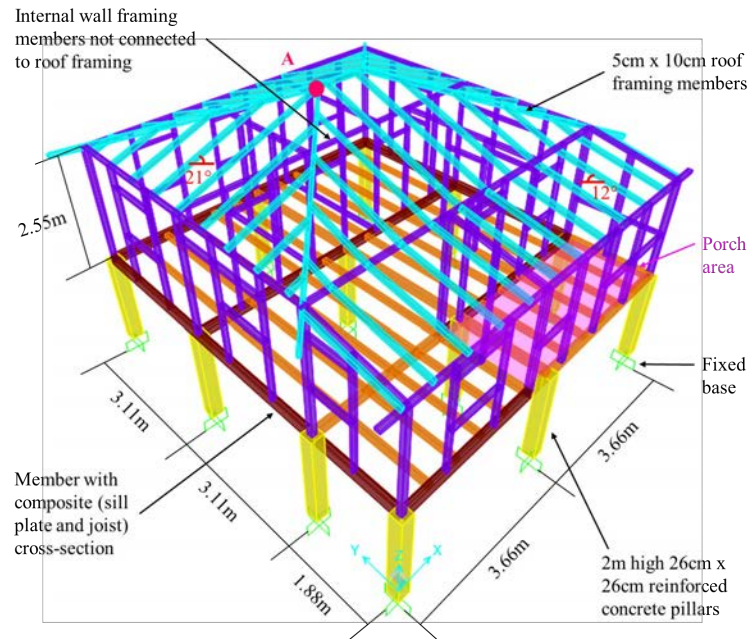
3D frame model of elevated timber building with hip roof in SAP2000
